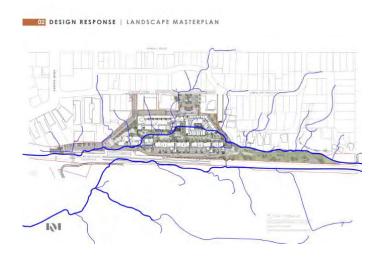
Consented Summerset Retirement Village Landscape Masterplan with existing overflow paths (in blue) added by Ava Wright.
